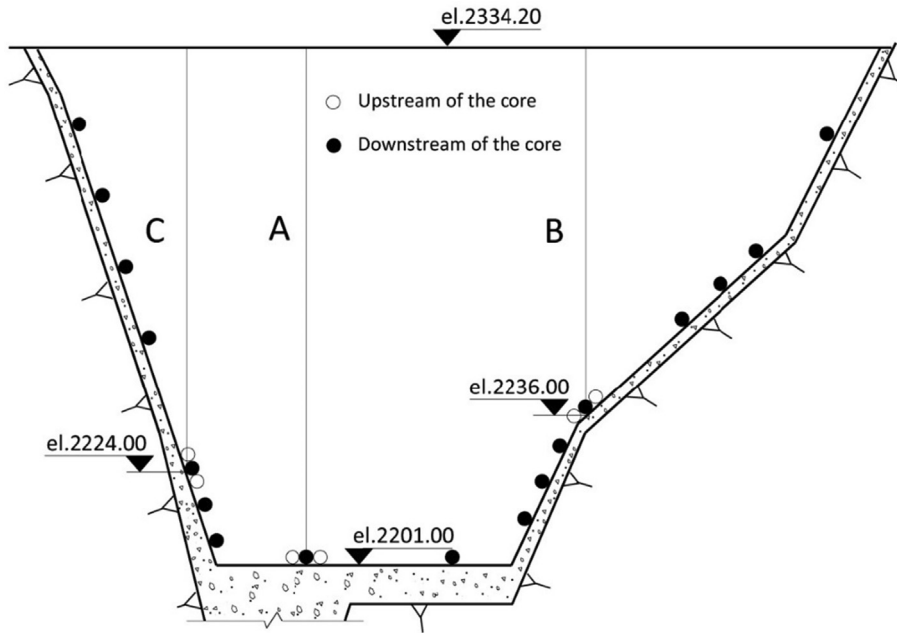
Piezometers at the top of the concrete plinth and upstream and downstream of the asphalt core.
